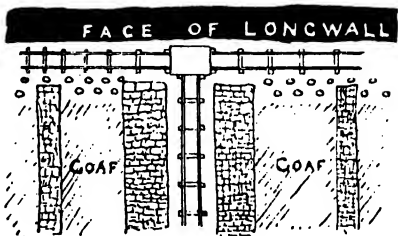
Plan showing Packwalls and Timbering at Face of Longwall, and Tramroad laid along the Gateway and along line of Face
